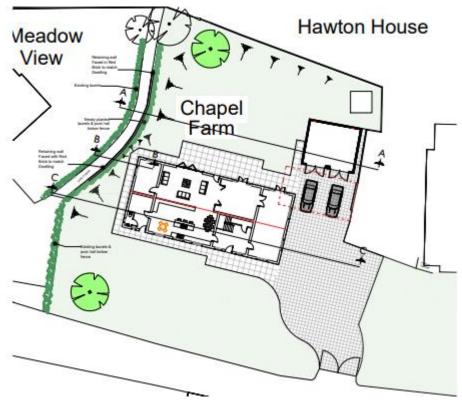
Proposed Site Layout Plan (received 03 January 2023)
